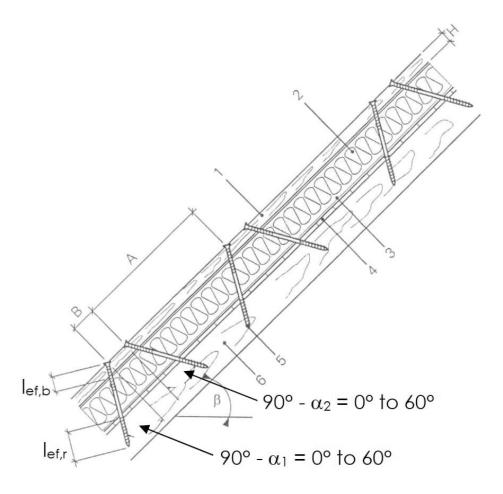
Fastening of thermal insulation material on top of rafters – Structural system for alternatively inclined screws
